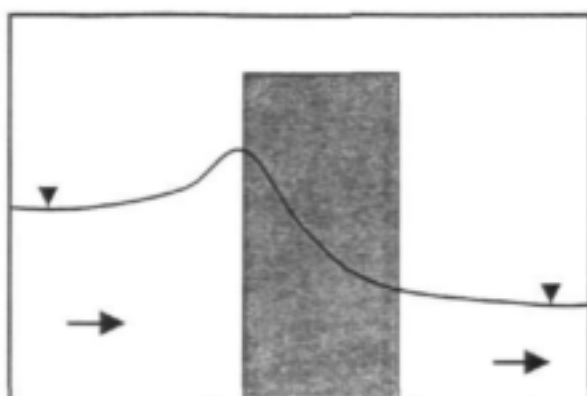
Typical longitudinal flow pattern at a bridge pier, water flowing from left to right
